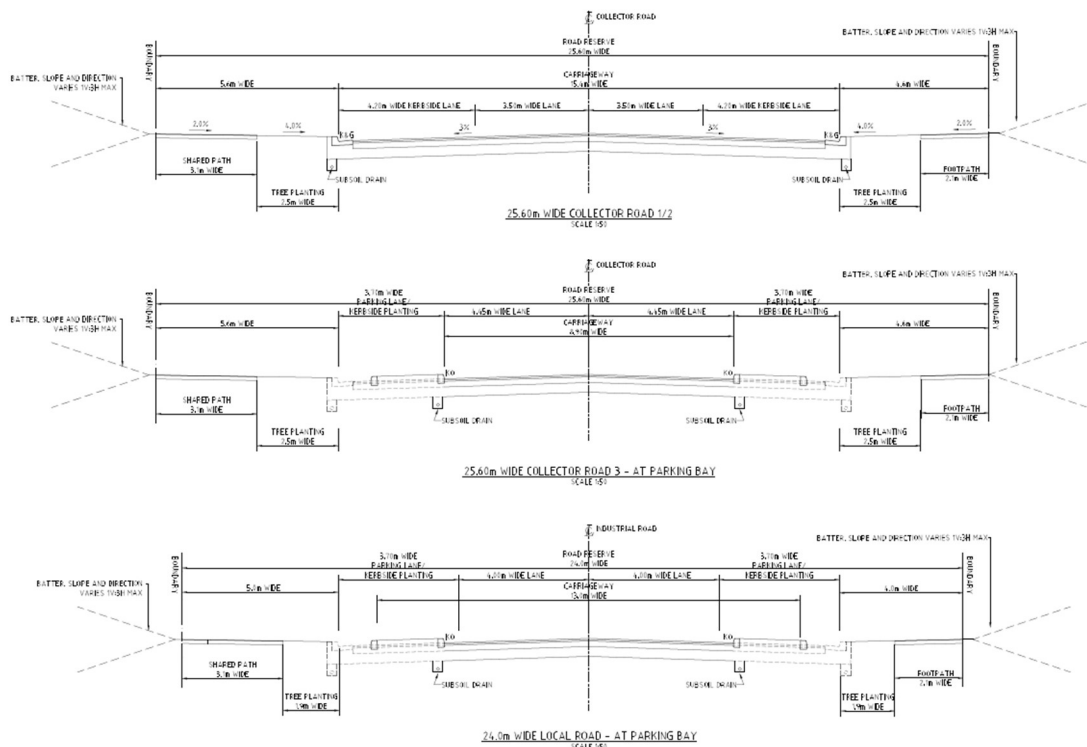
Typical Road Cross Sections (Source: Costin Roe)
